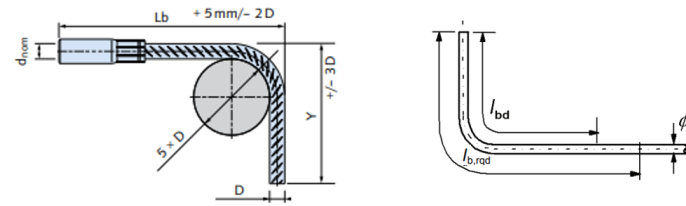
Bend anchor coupling (Halfen, 2017)
